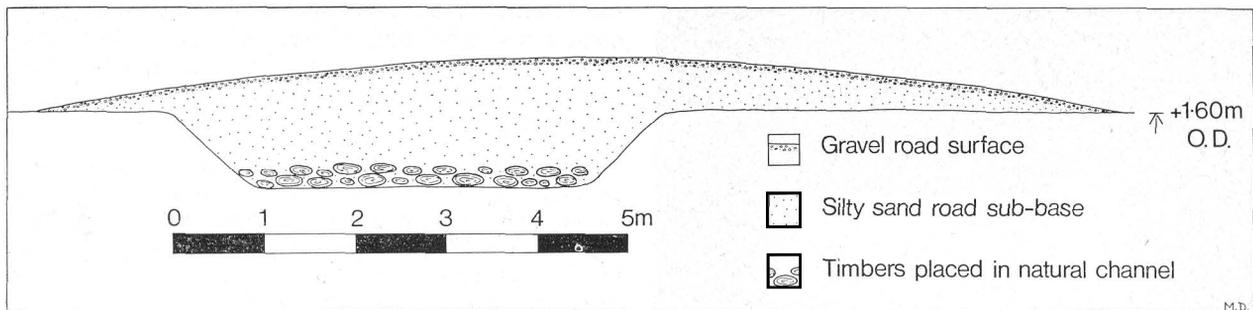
Reconstructed section through Watling Street and underlying natural channel.
